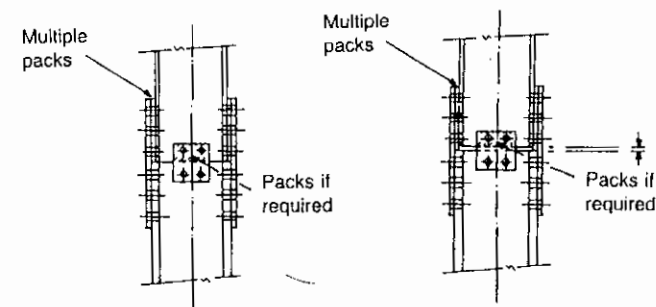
Alternate forms of column splice: (a) Column splice, ends prepared for direct bearing. (b) Column splice ends not prepared for direct bearing.
